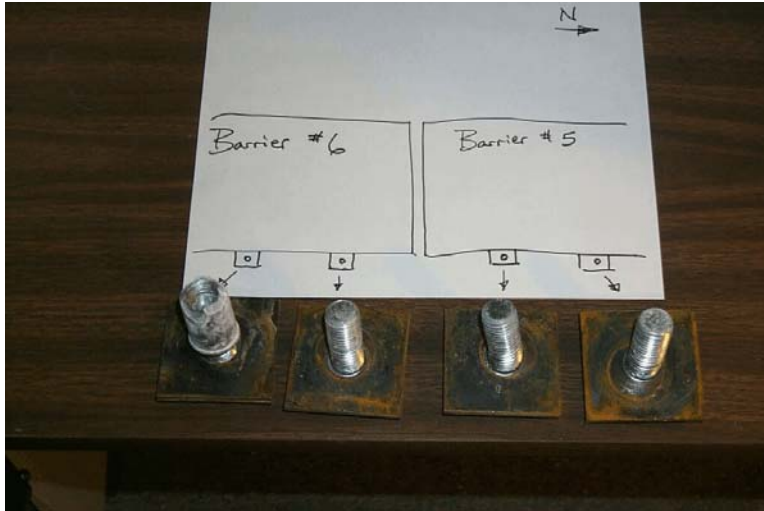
Tie-Down Anchor Bolt Damage, Test HTB-1
